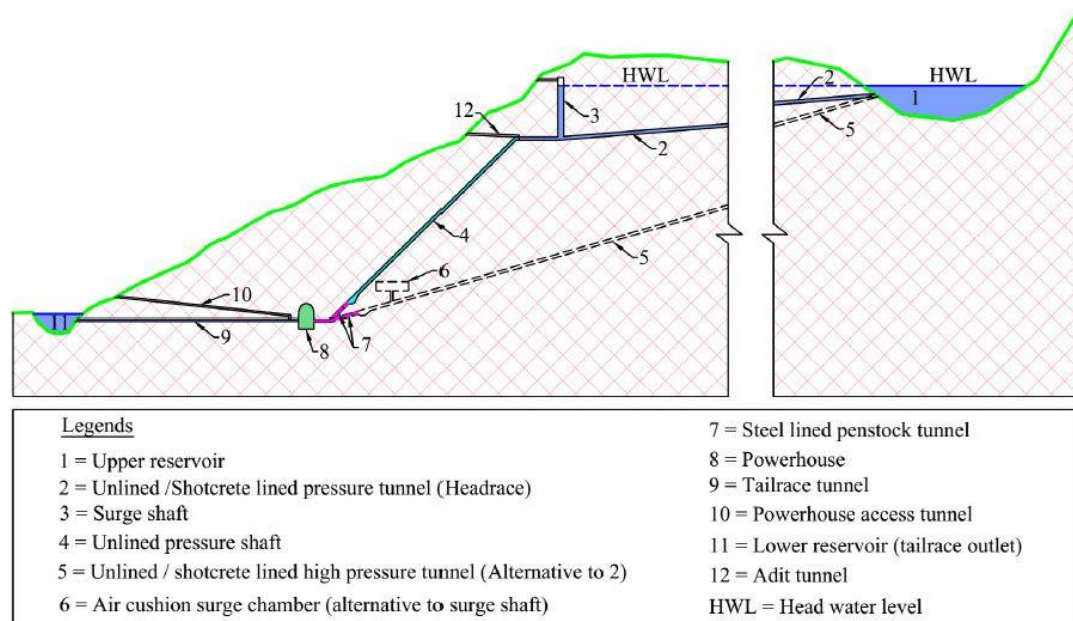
Typical layout of underground hydropower scheme with unlined pressure shaft and tunnel (Basnet 2018)
